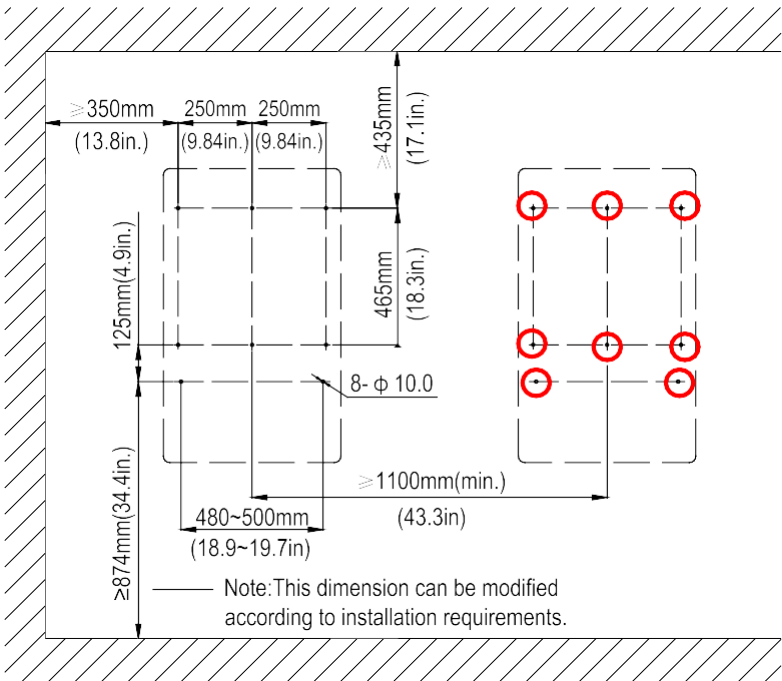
Dimensions of the Bracket Anchoring Holes for Mounting
